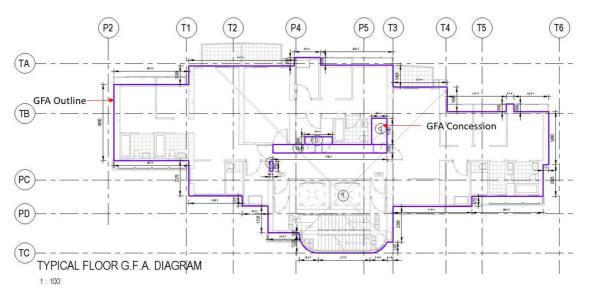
Area Plan – Overlap 2 Area Plans on same view
